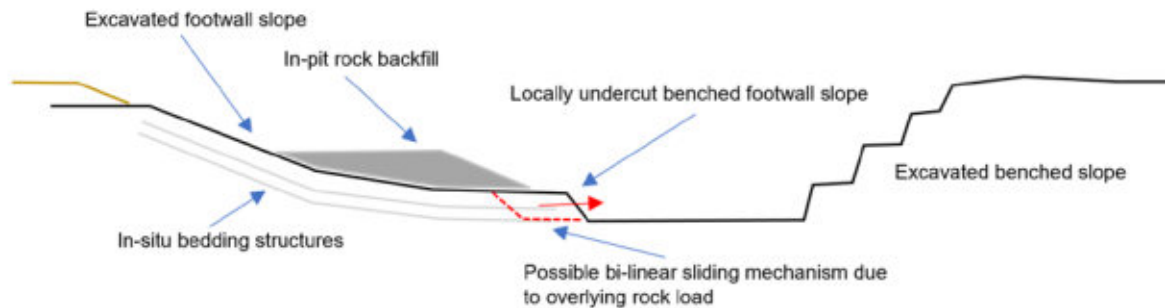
Conceptual example of the backfill rock loading on a locally undercut footwall slope
